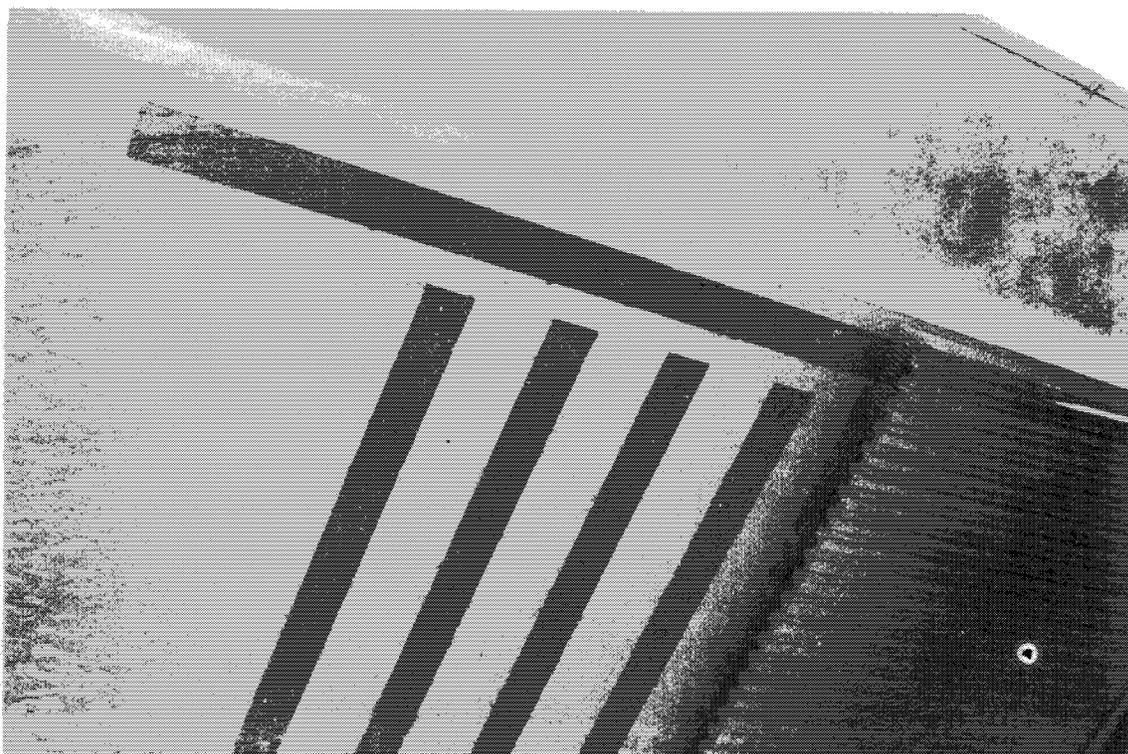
Steel Plate Bonding and Exhaust/ Temperature Protection Over Railway Line
